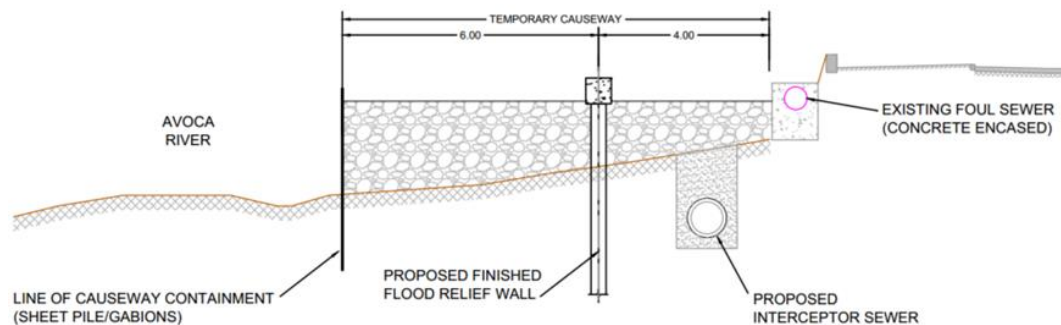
Overview of proposed temporary causeway required to construct the river based sewers
